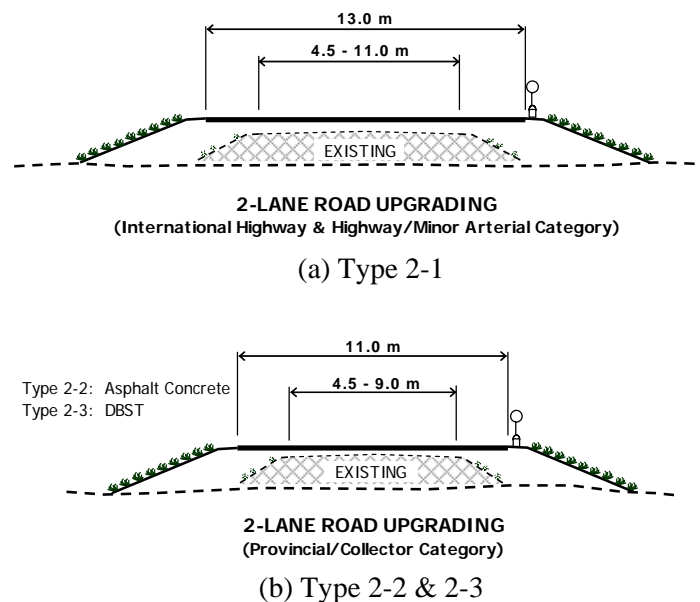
1-Digit Road Development Master Plan with Typical Road Cross-Sections
